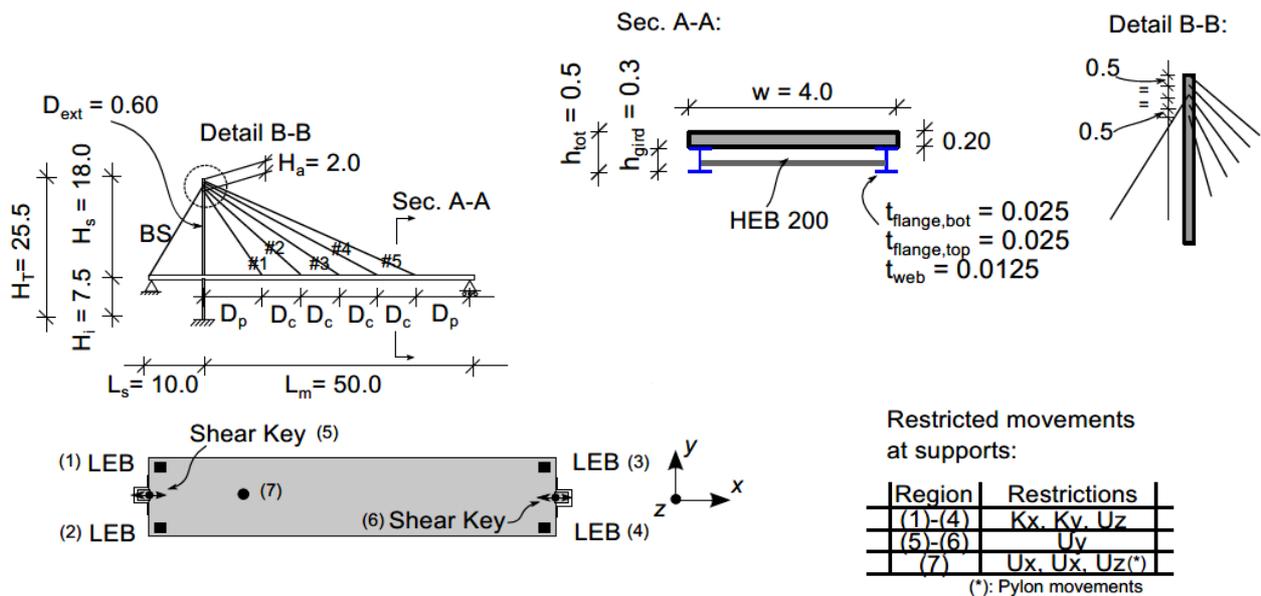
Geometric and structural characteristics of the benchmark cable-stayed footbridge; articulation of the footbridge deck. Dimensions in meters.
